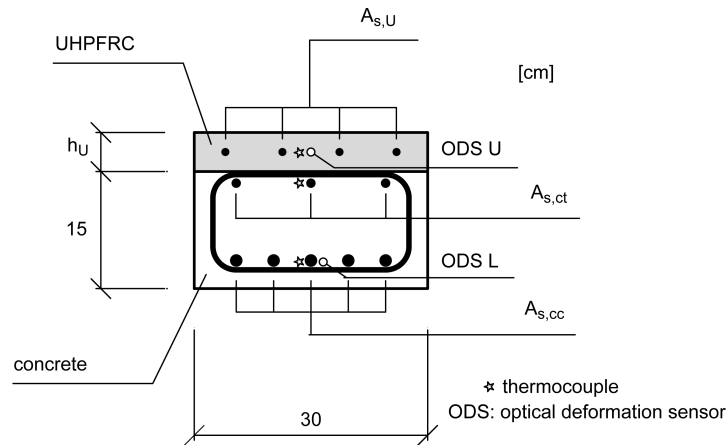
Cross-section of the composite “UHPFRC-concrete” beams
